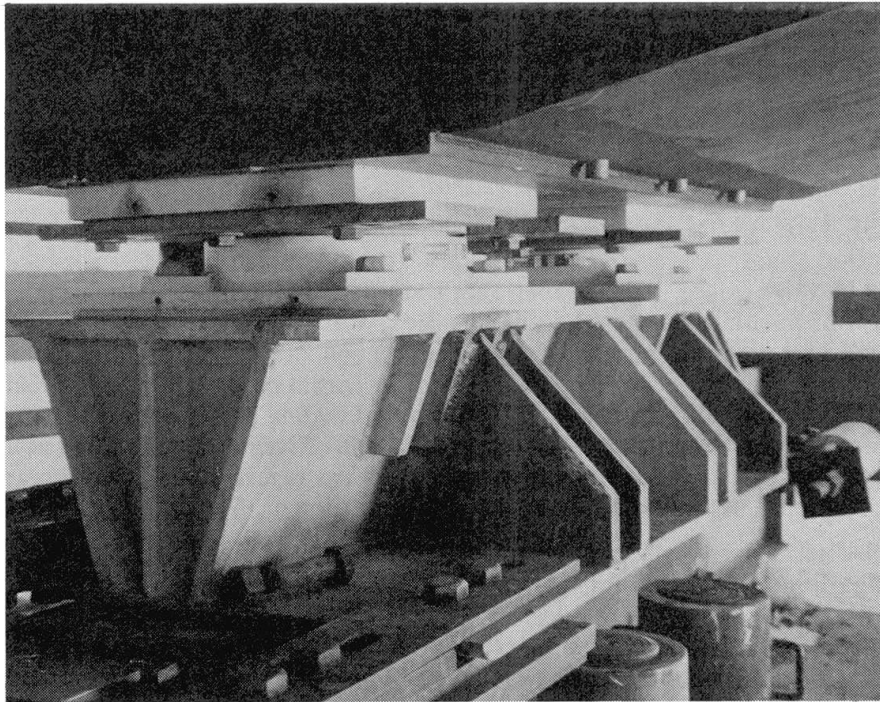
Details of launching carriage and bearing assembly showing bearings; bolted steel plates to inhibit translation of bridge relative to bearings; welded launching carriage; and (bottom left) steel-reinforced Teflon-coated neoprene pad projecting from beneath the launching carriage.
